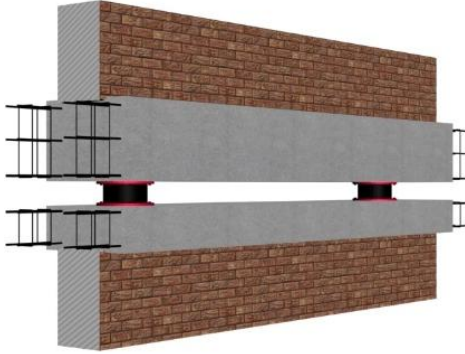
3D views of the seismic isolation system installation stages in the existing building with stone bearing walls
